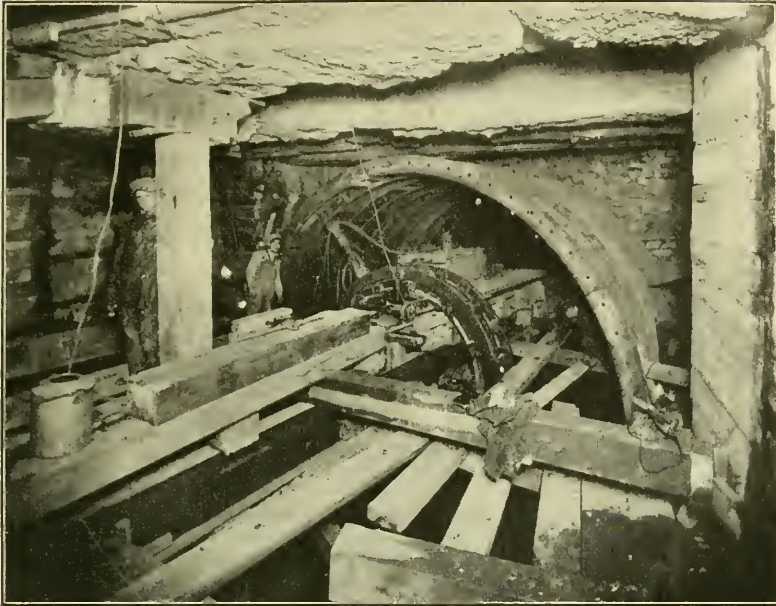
EAST TUNNEL AT FULTON STREET. FOOTING COURSE OF BUILDING IS SHOWN OVERHEAD.
